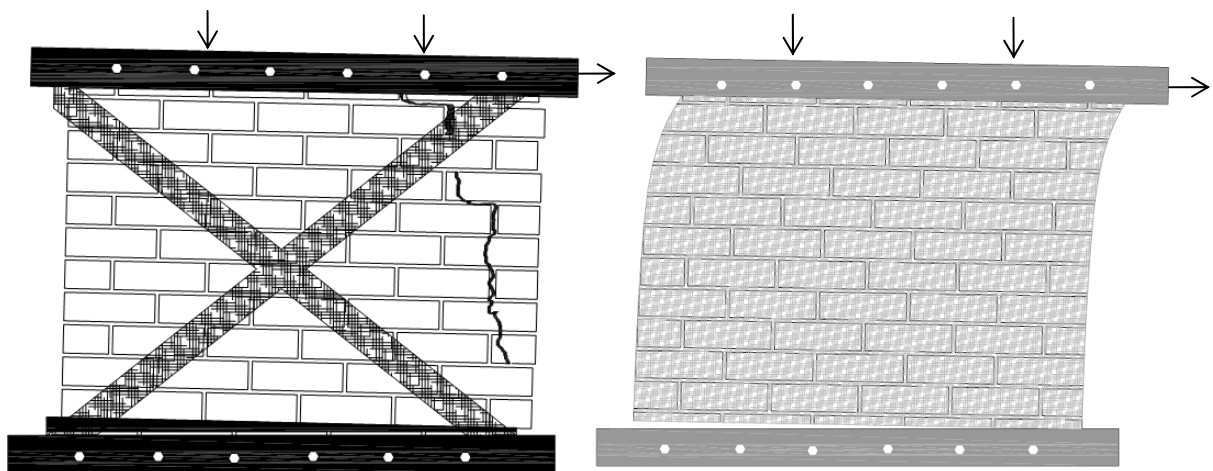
(a) Crack pattern in NSD wall; (b) Inelastic deformation and rotation at the wall bottom for fully wrapped wall with Jute-FRP
